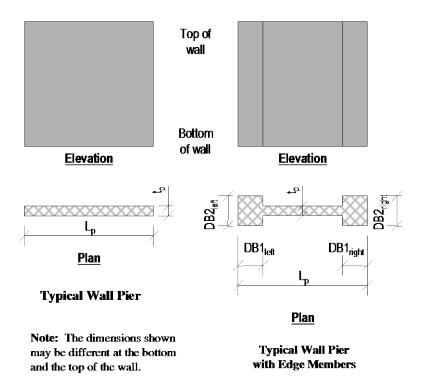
Typical Wall Pier Dimensions Used for Simplified Design
